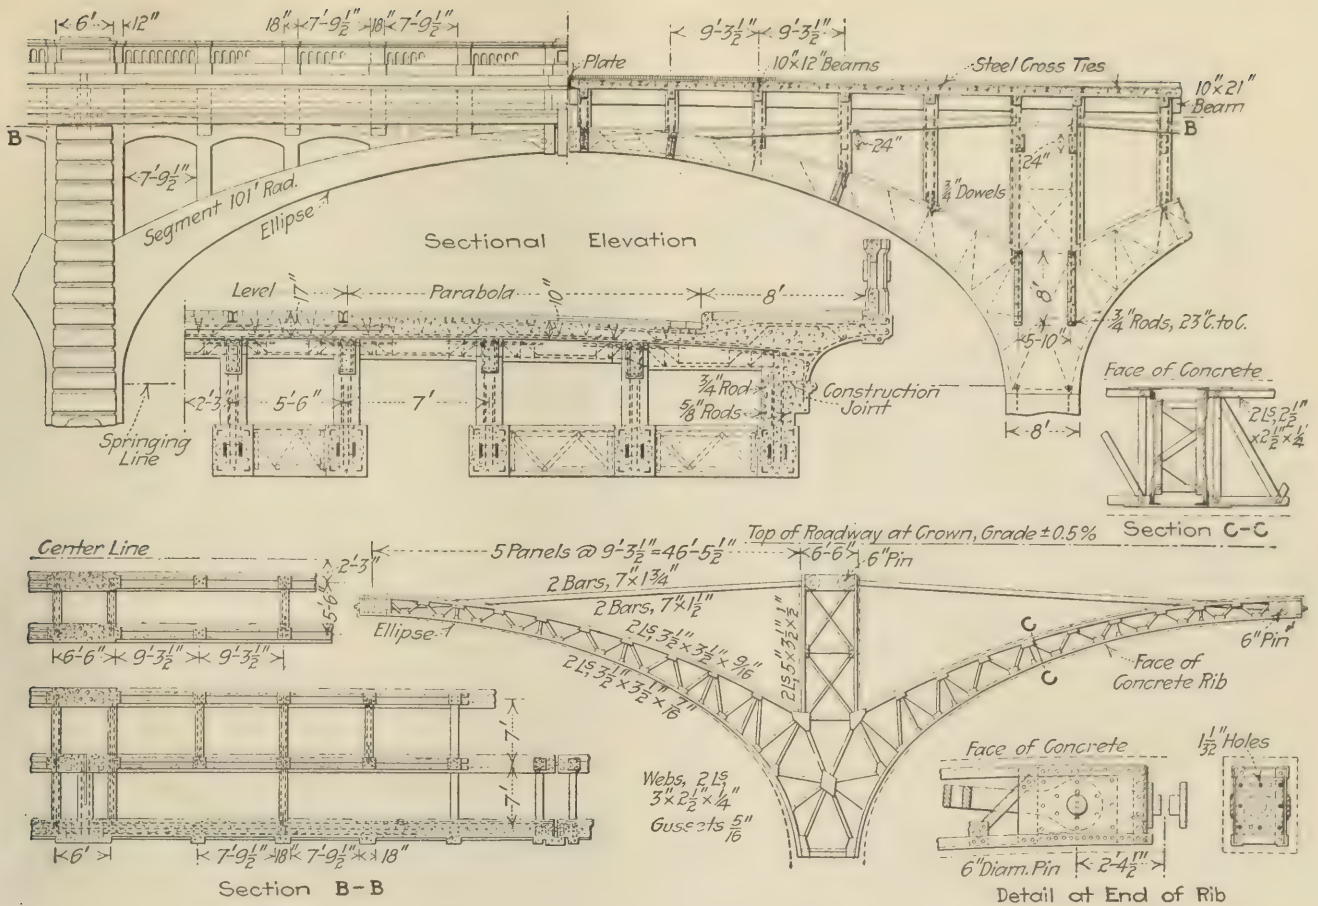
TYPICAL CANTILEVER ARCH OF HANOVER ST., NORTH CROSSING
